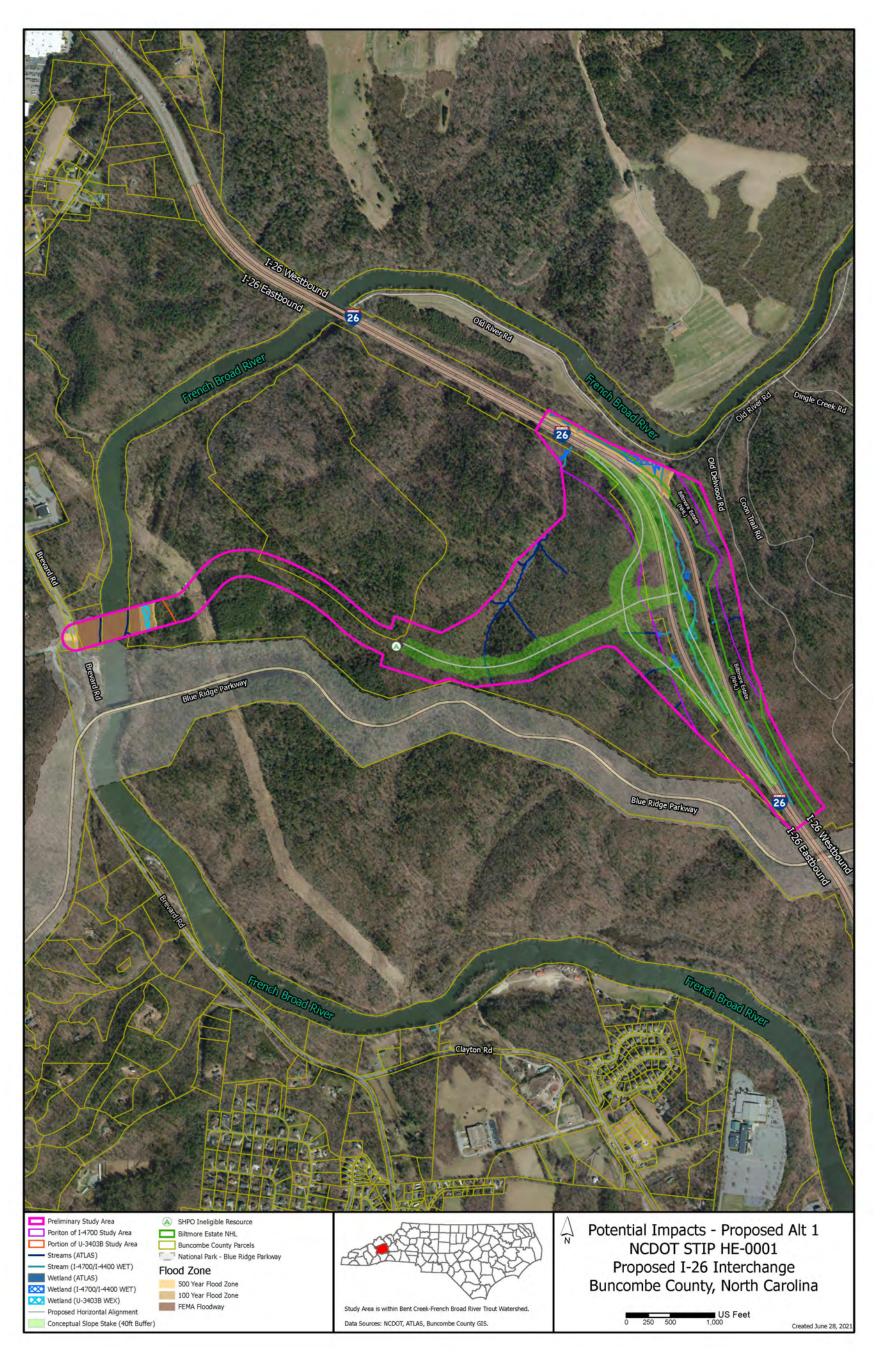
POTENTIAL IMPACTS, PROPOSED BUILD ALTERNATIVE 1
